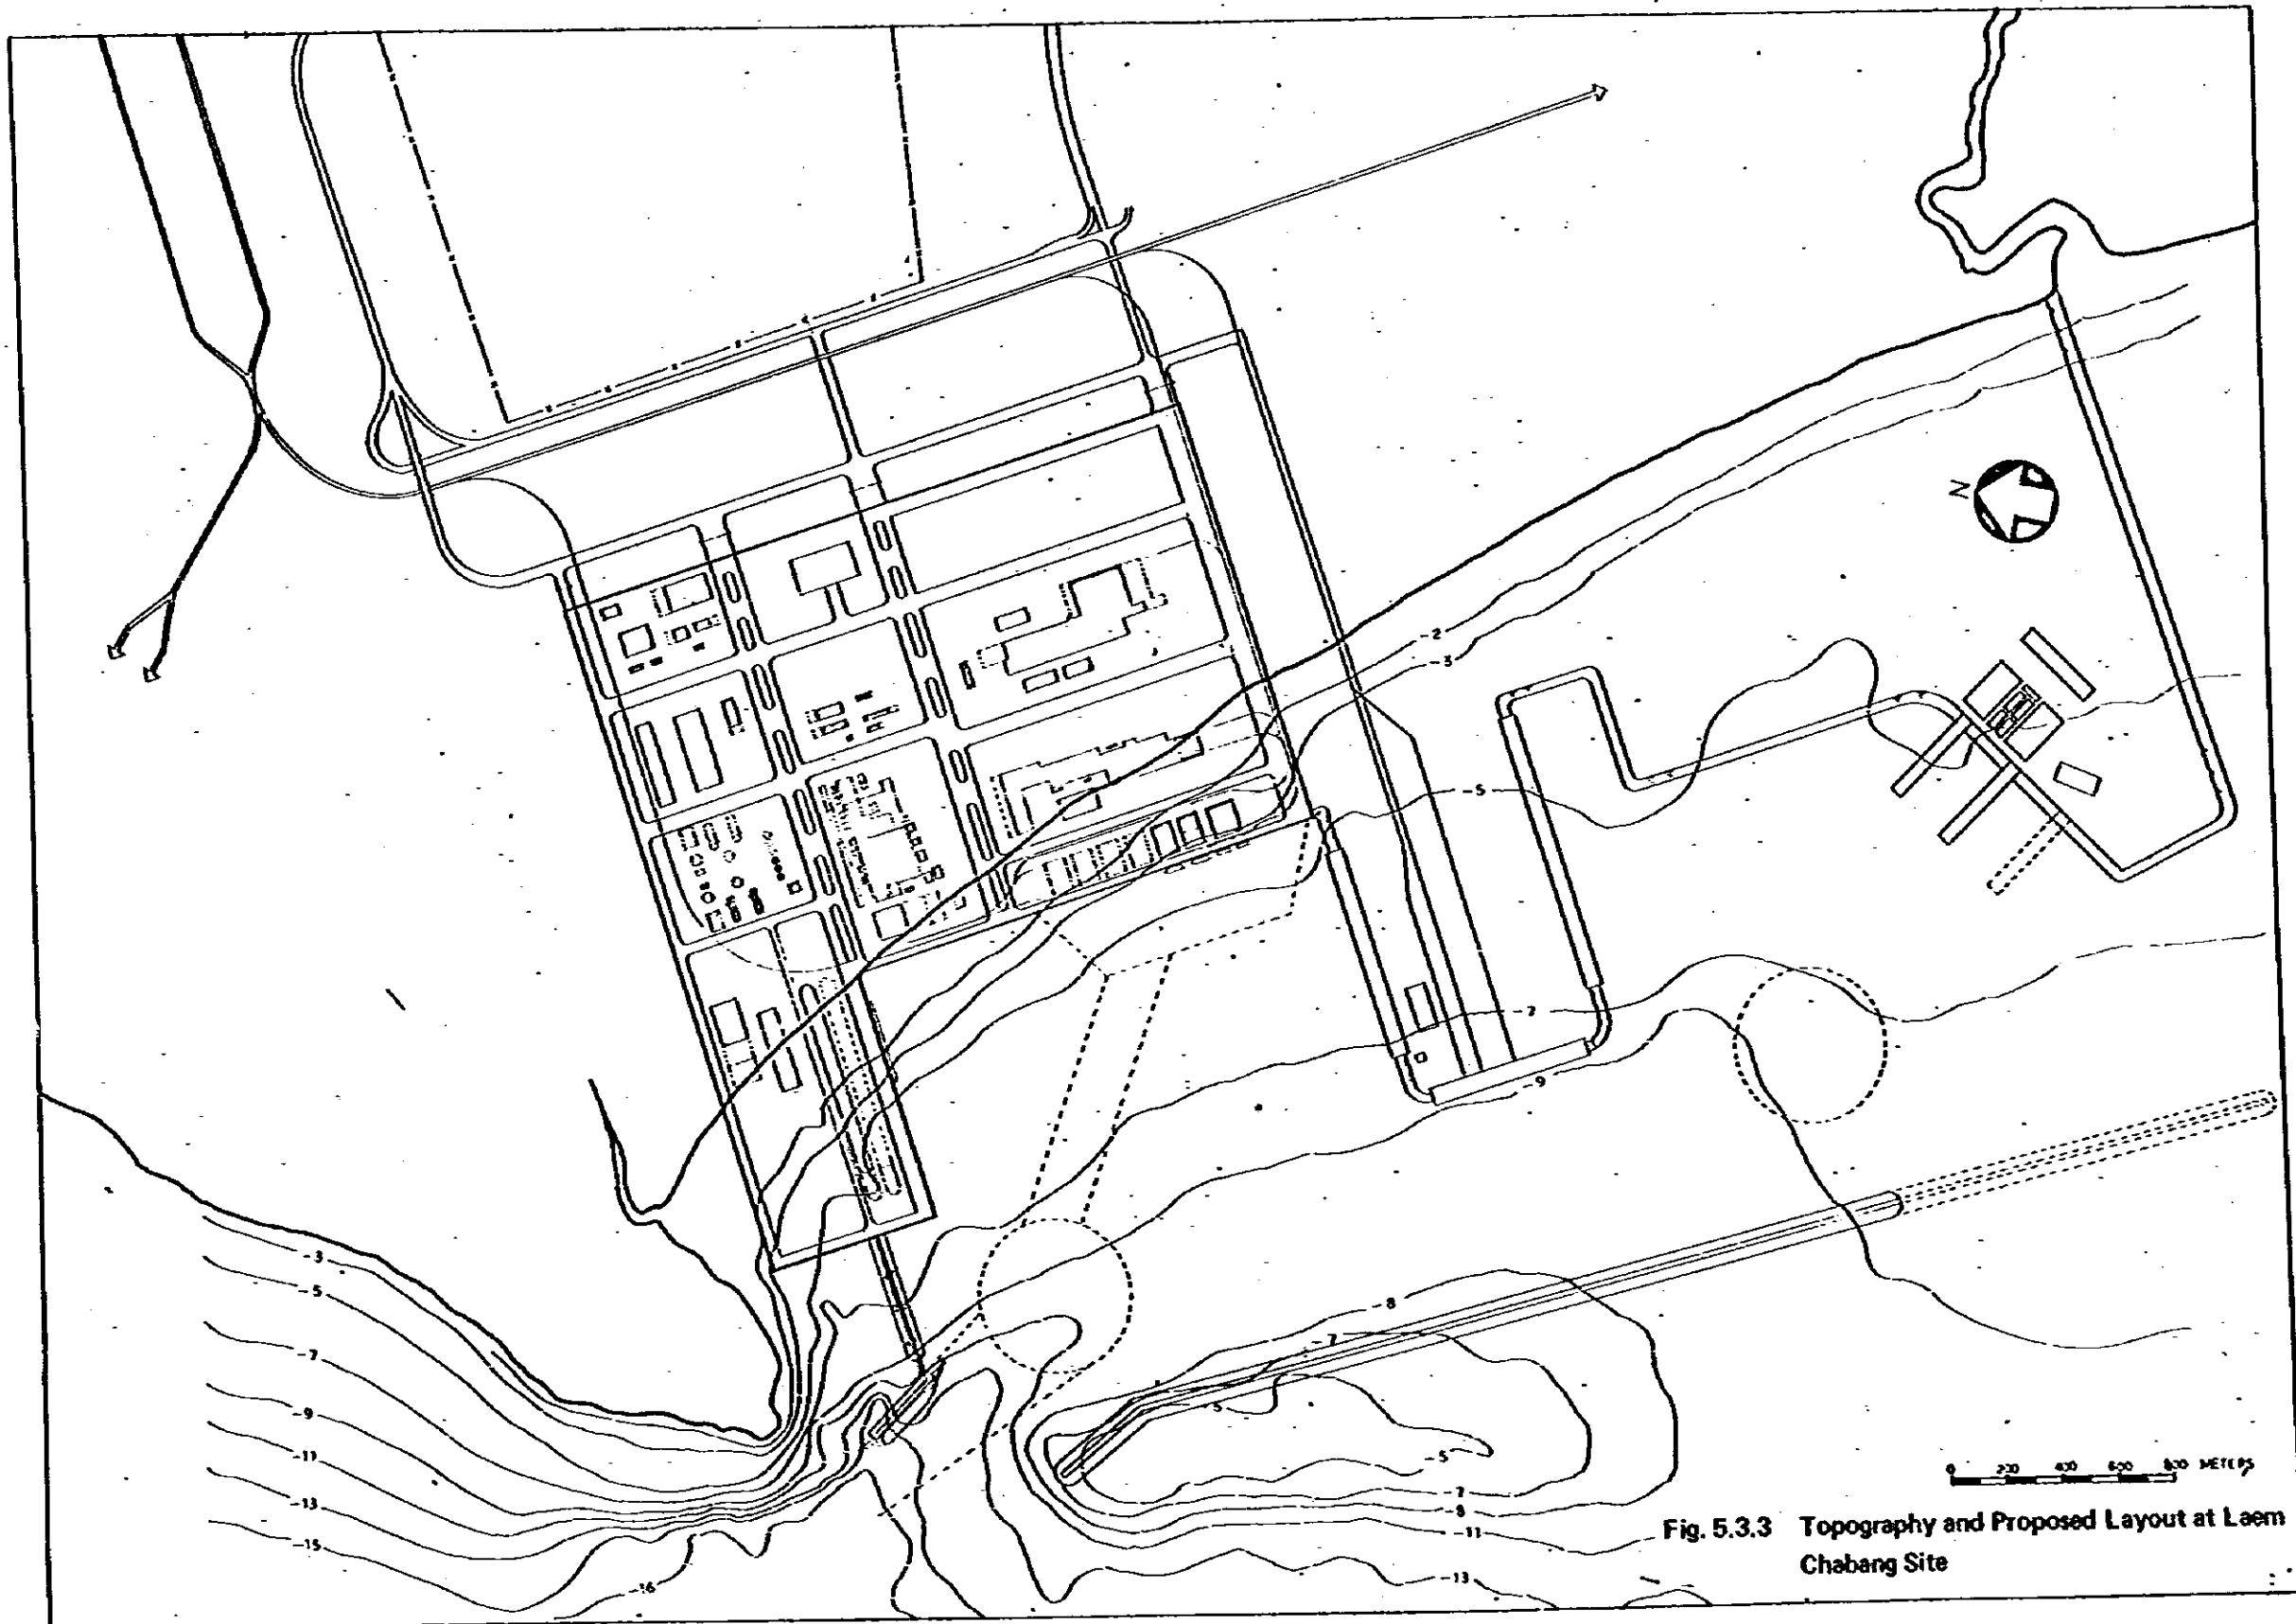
Topography and Proposed Layout at Laem Chabang Site
